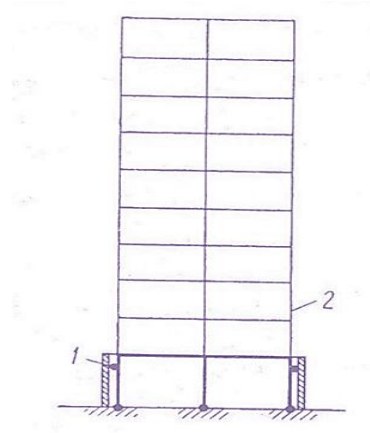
Diagram of a large panel house with a "flexible floor" at the bottom
